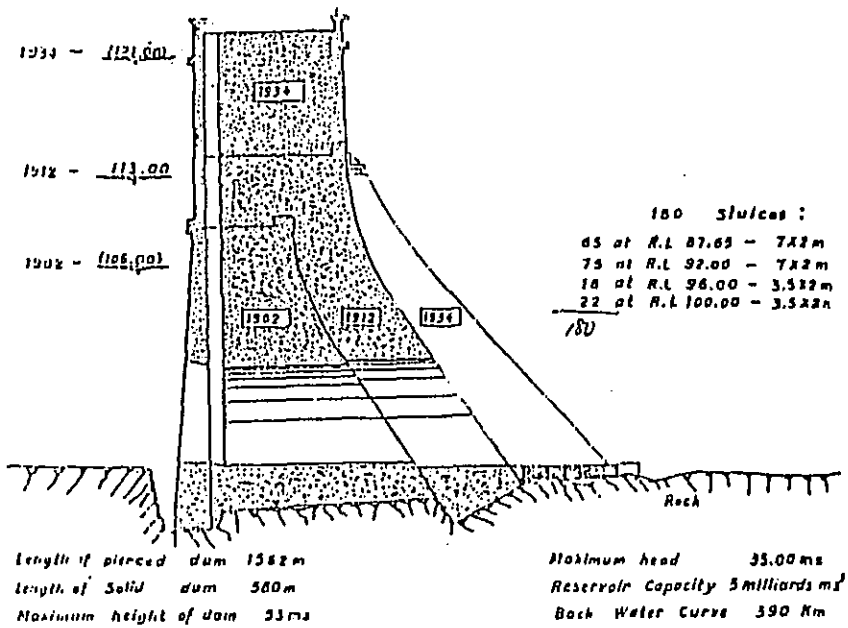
Aswan Dam: Original Dam, First & Second Heightenings
